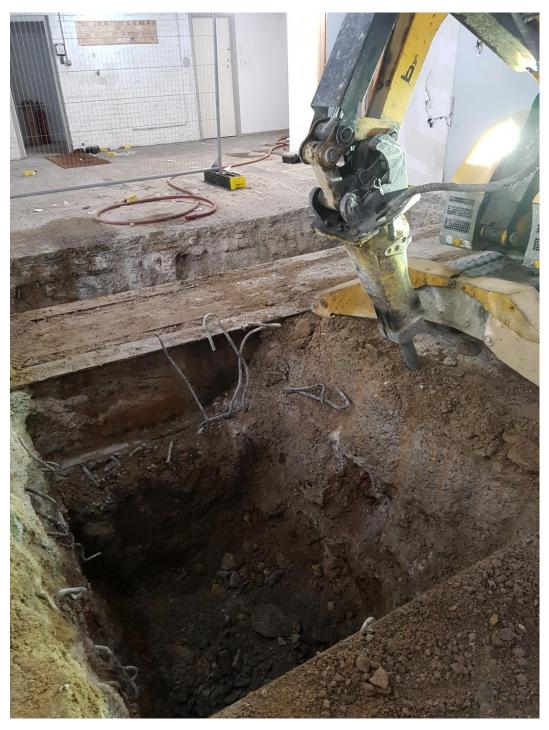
TRENCH 2 FACING NORTH SHOWING POST-MEDIEVAL DUMP DEPOSIT [8] AT THE LIMIT OF EXCAVATION
